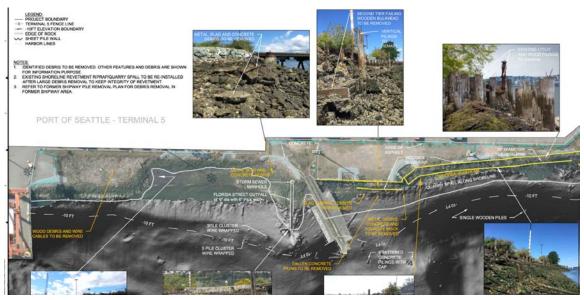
Draft Debris Removal Plan Adjacent to Gravel Beach Area #2
